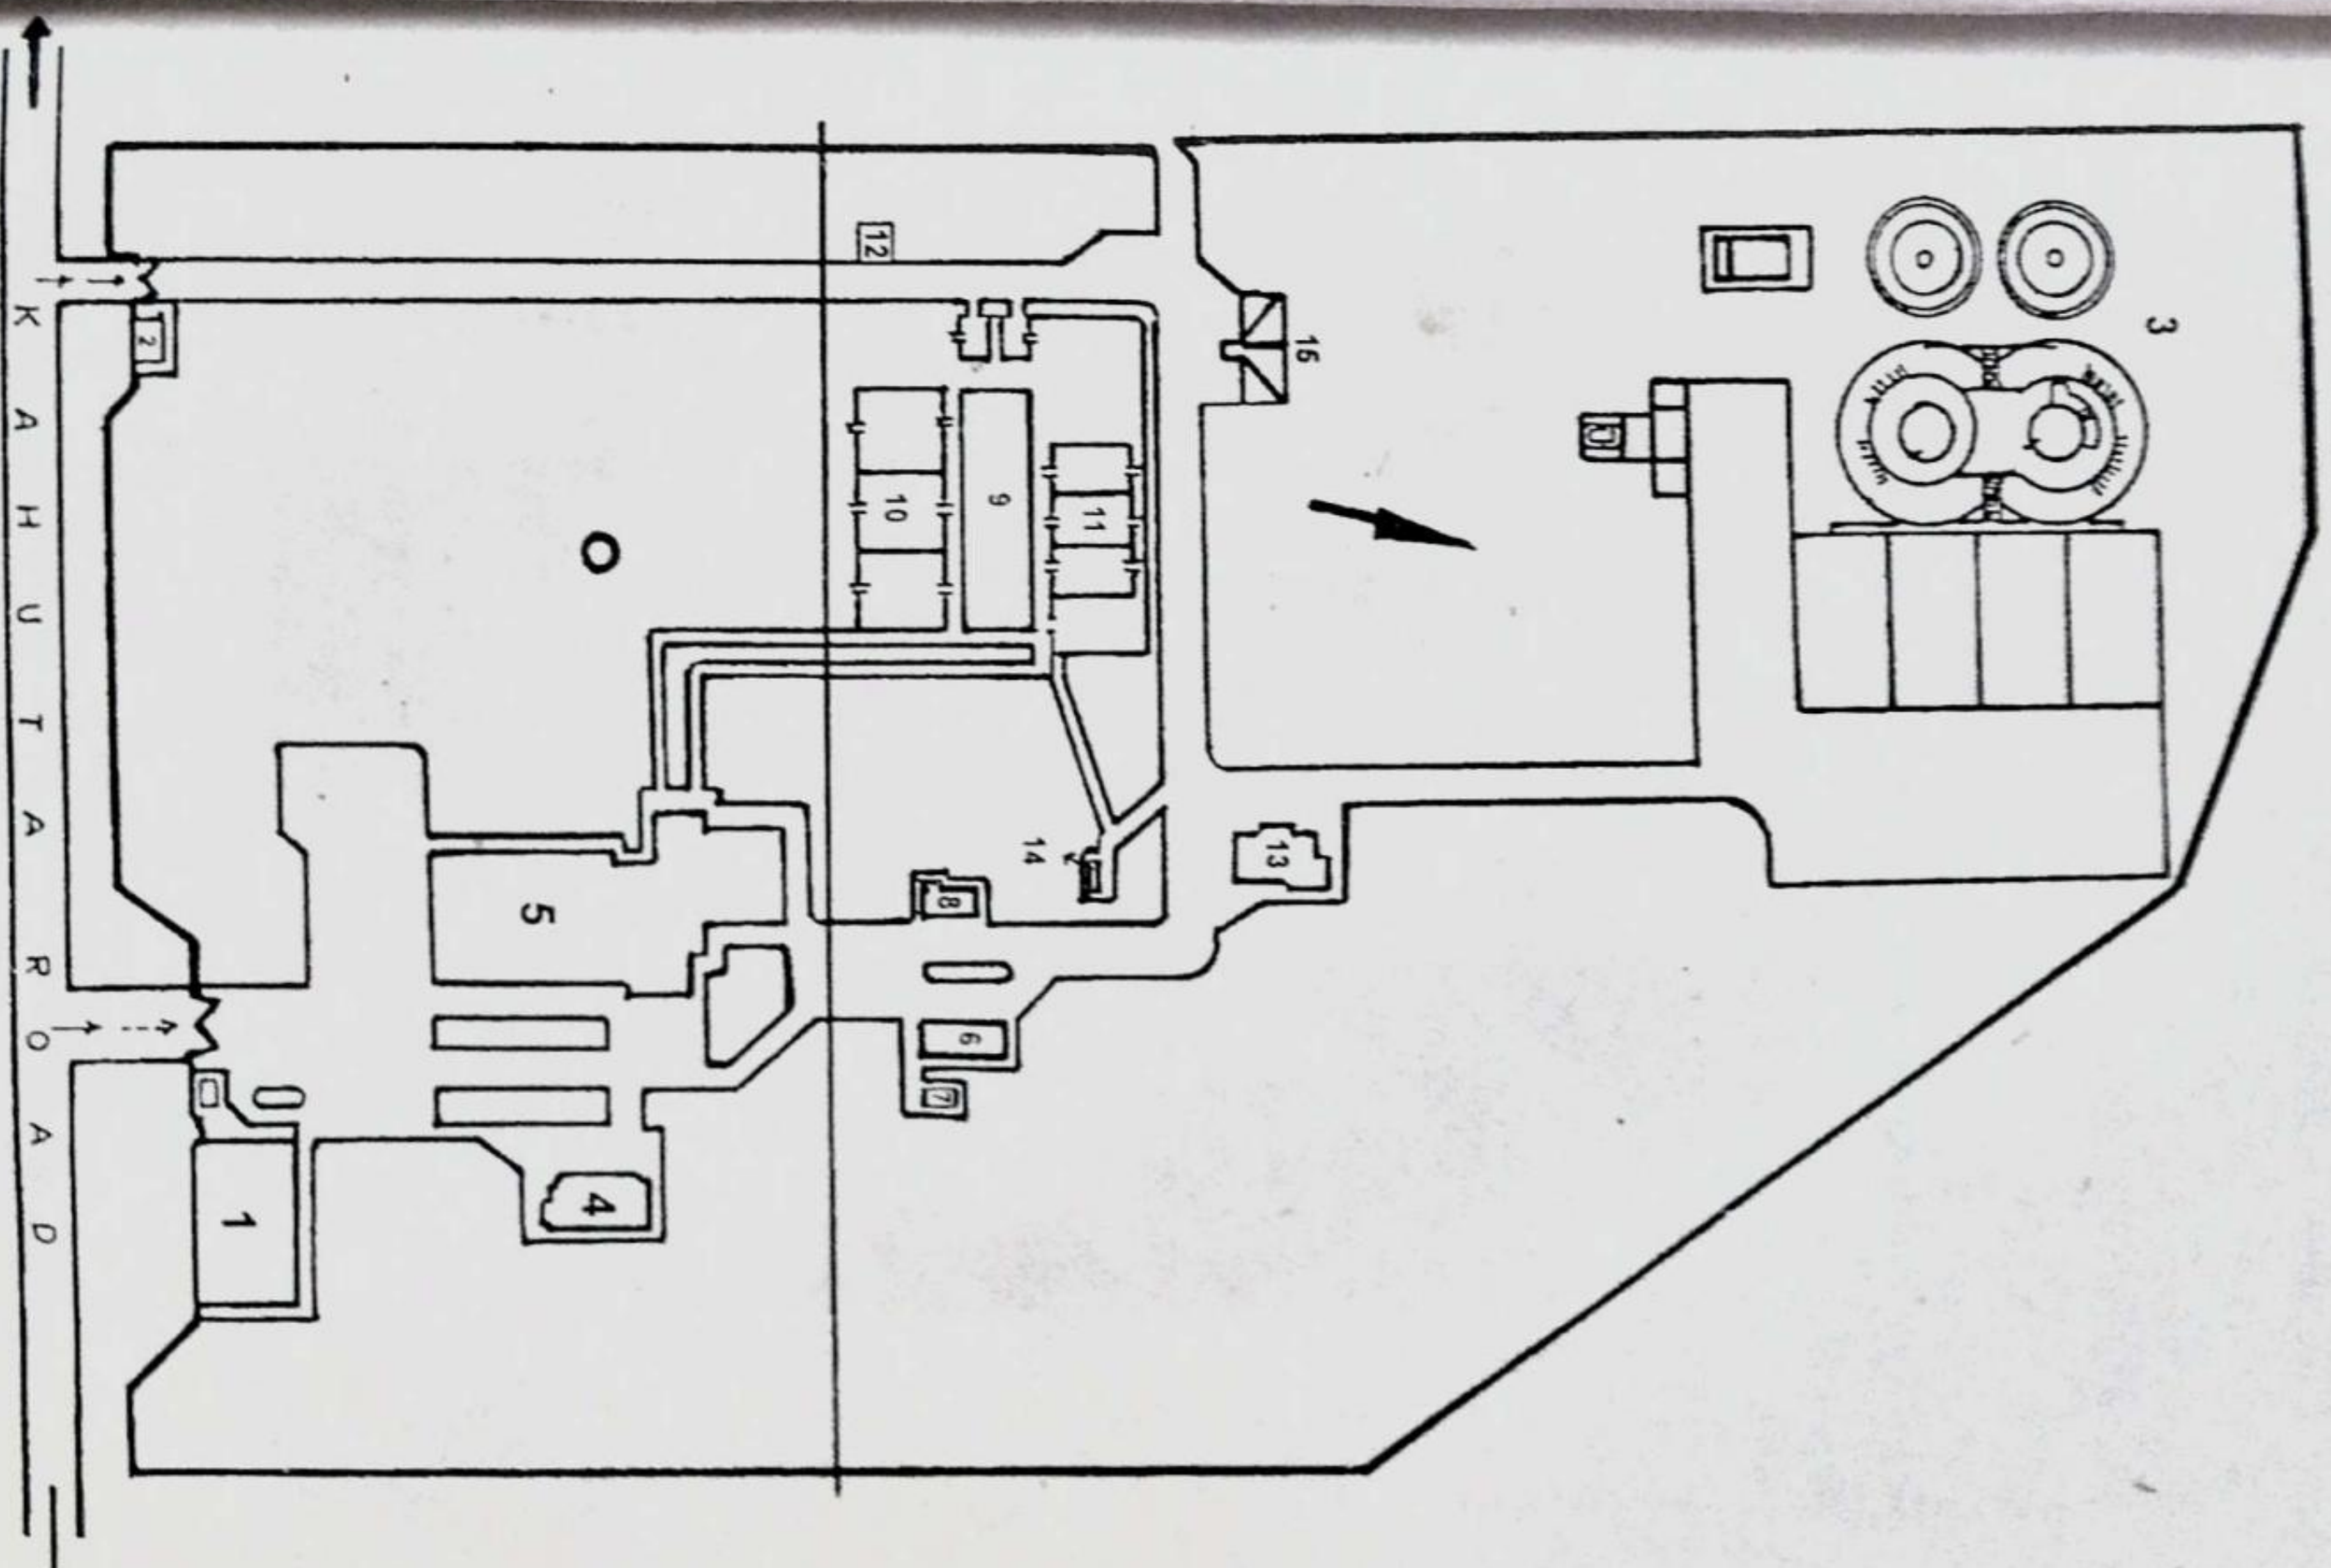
Layout Plan Of Sihala Slaughter House, Islamabad
